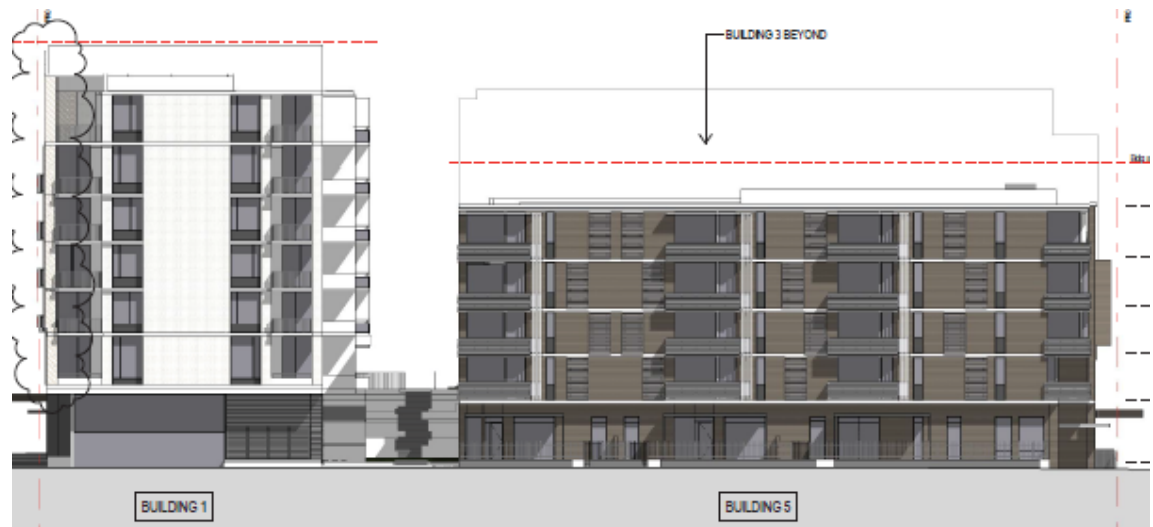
Lachlan Place North elevation of Buildings 1 and 5
